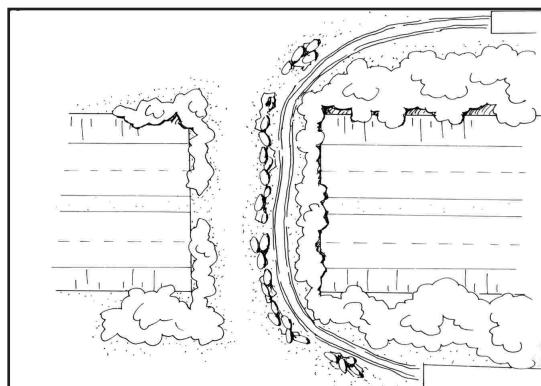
Tracks or small roads on an overpass should not be paved and should be placed at the side to leave the maximum possible width for the vegetated part of the overpass. Screening the road from the rest of the overpass with boulders, etc. is not always necessary.
